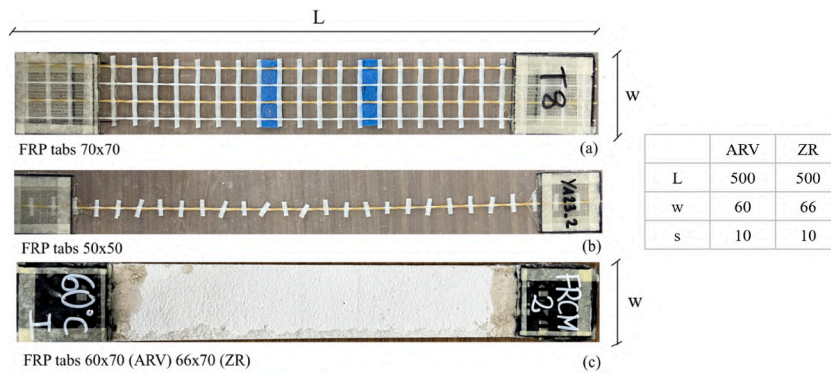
Geometrical dimensions (in mm) of: (a) textile, (b) bundle, (c) FRCM coupon.
